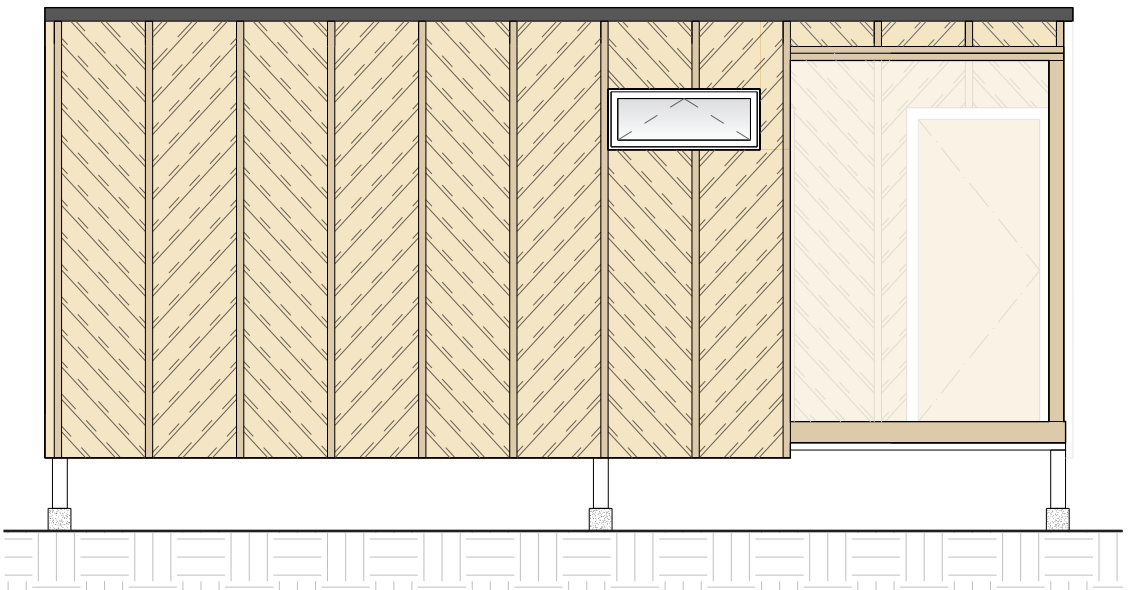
ELEVATION B-B PRIOR TO THE BUILT. SCALE 1:50
